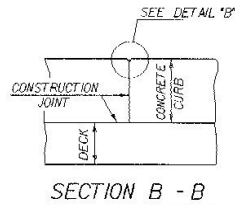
DETAIL FOR SHEET MEMBRANE AT END OF BRIDGE
